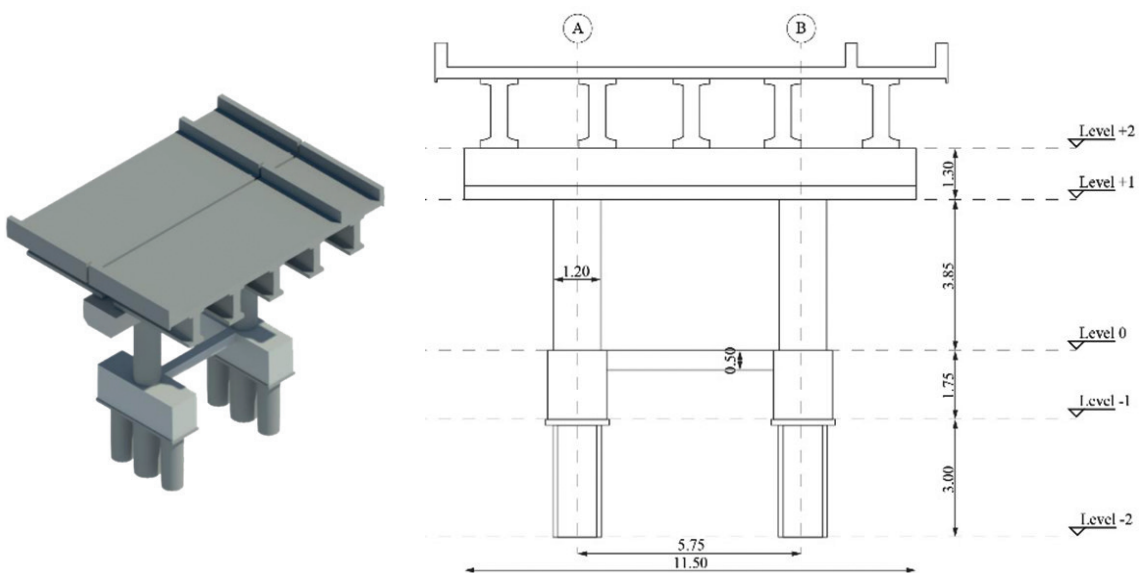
Model of the Brabau bridge pier analysed in this study.
